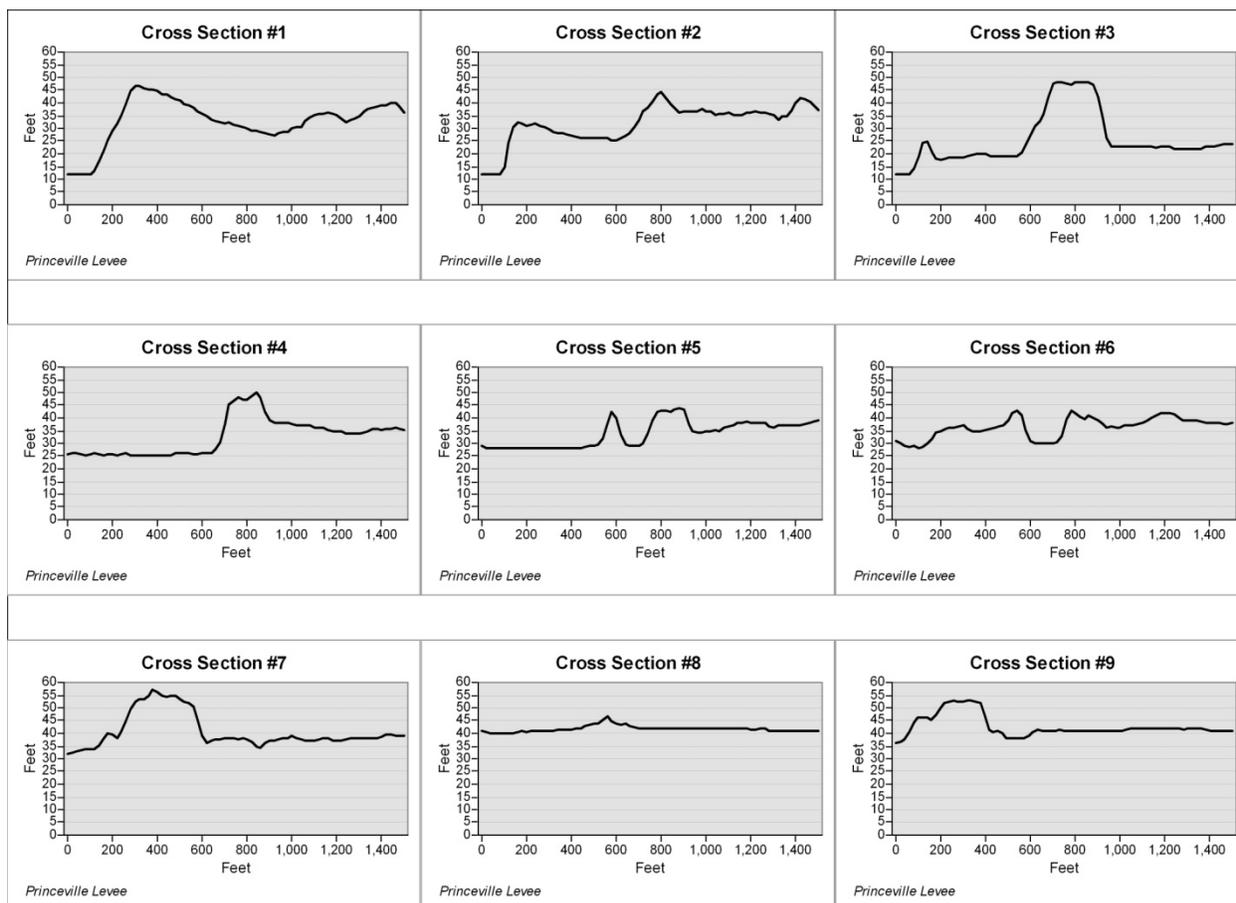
Cross Section U.S. Highway 64 and Original Dike (levee)
